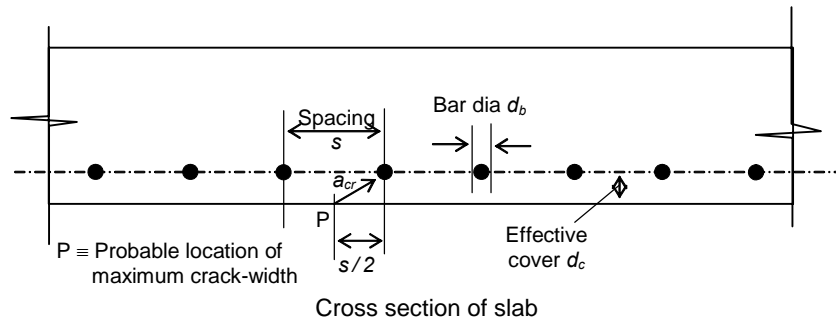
Geometrical parameters of relevance in determining flexural crack-width in a slab
